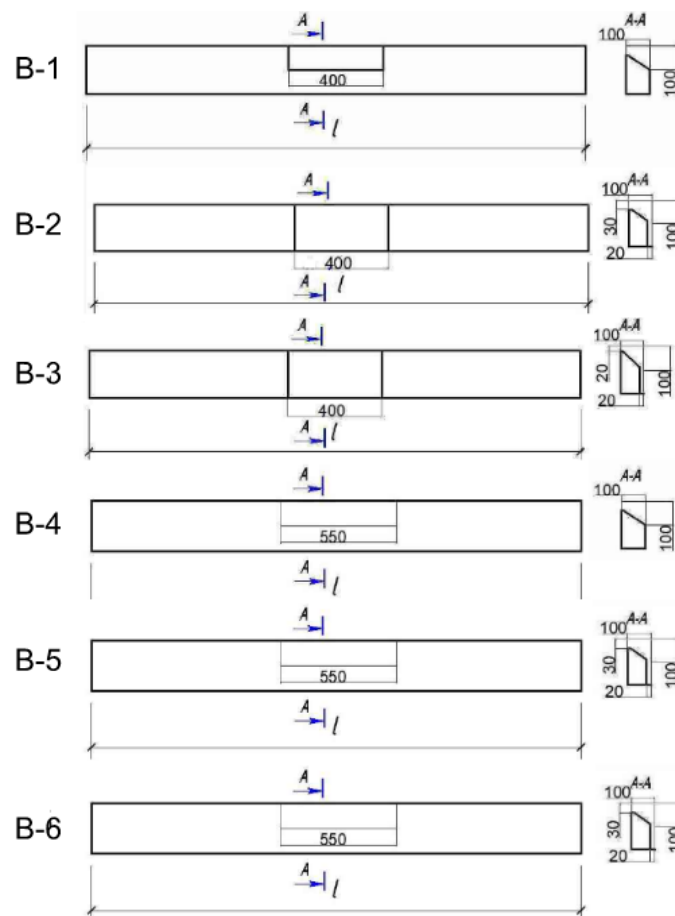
Scheme of damage to a reinforced concrete beam
